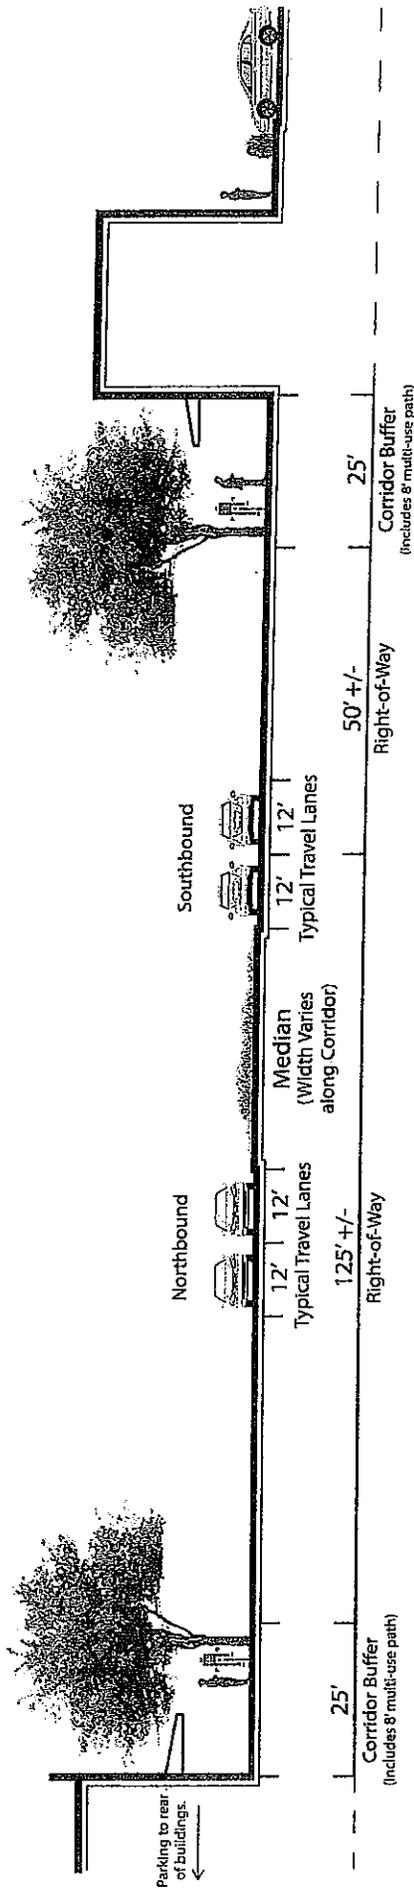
, Typical cross section along Highway Corridor Overlay District.
